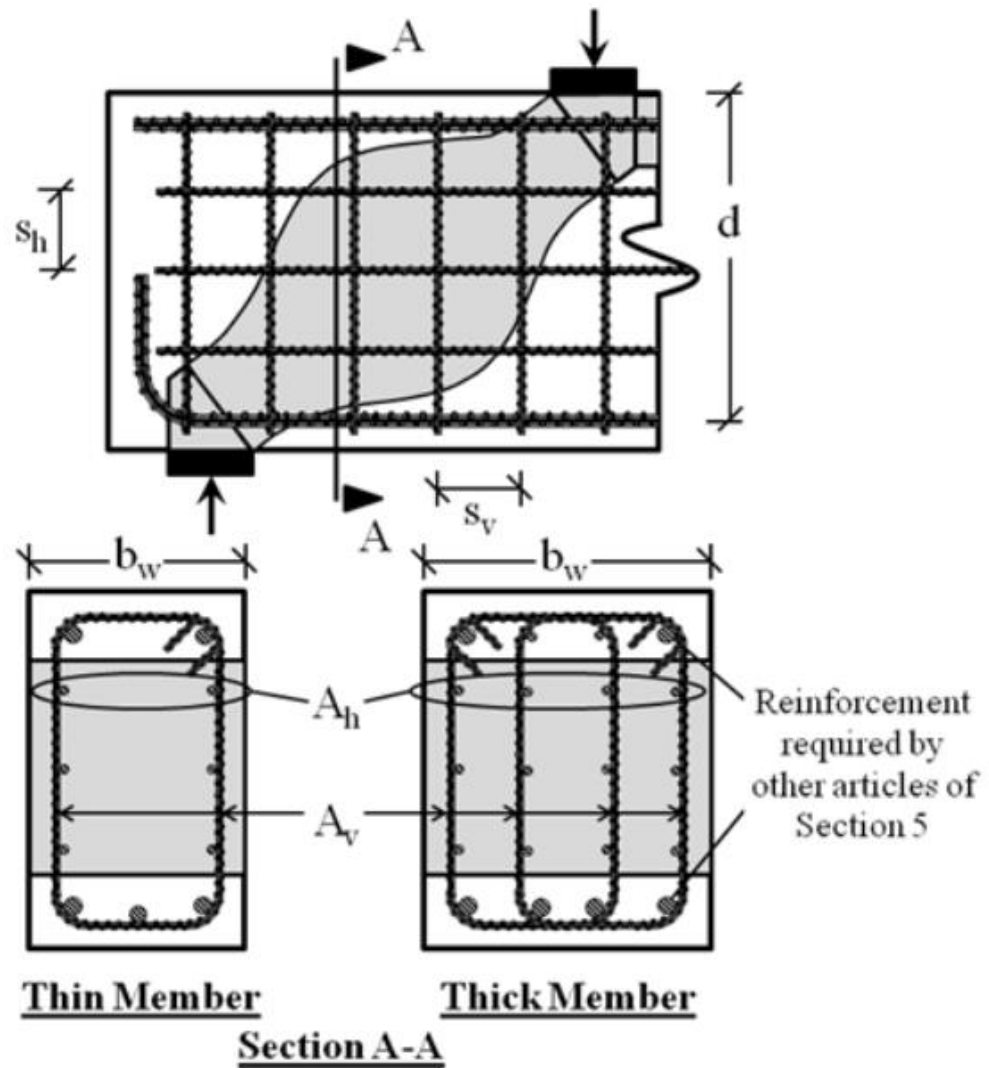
Crack control reinforcement (AASHTO LRFD, 2012)
